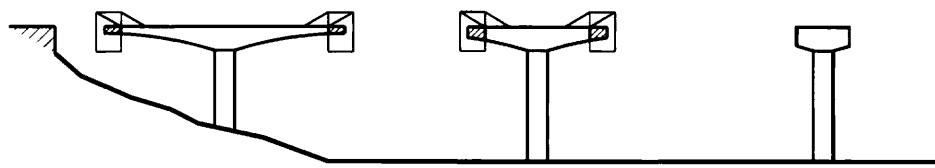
Balanced cantilevering of the Jesse H. Jones Bridge – USA [18]
